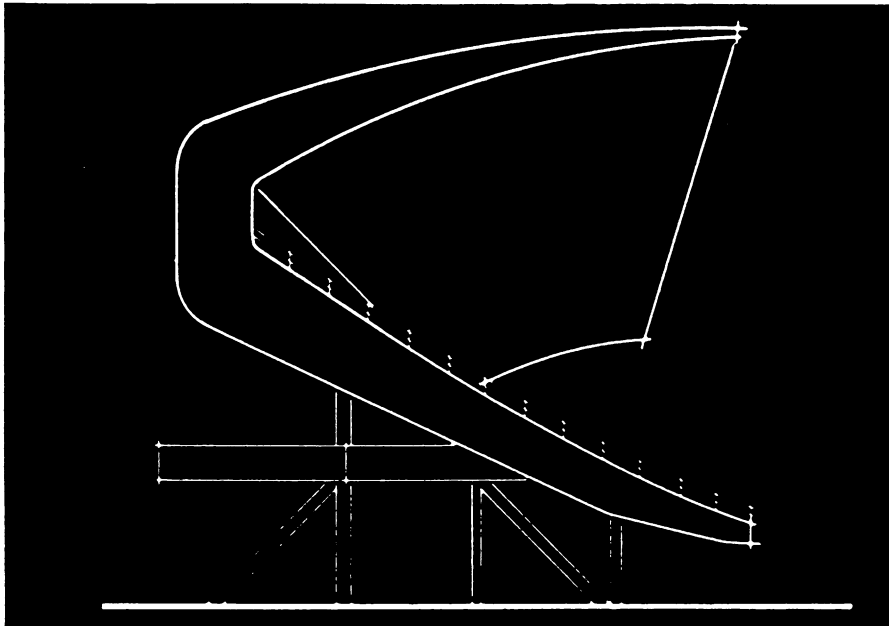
Caracas: Reinforced concrete tribune, span 25 m
